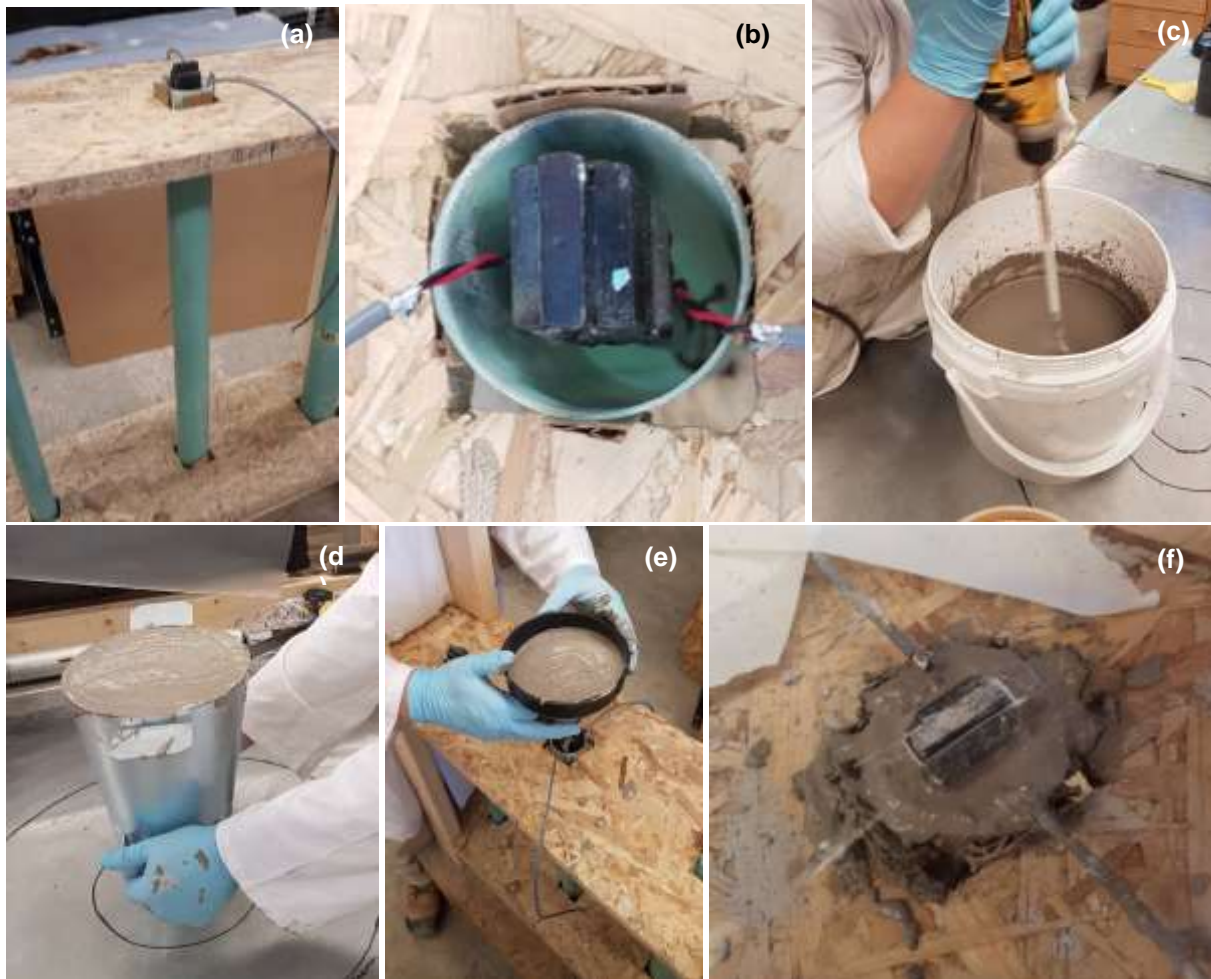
Specimen fabrication: (a) Steel core and FRP tubes are placed in casting stand; (b) tubes are shimmed to ensure steel is centered; (c) grout is mixed; (d) slump test is performed; (e) grout is funnelled into shells; and (f) top plastic cover is positioned to hold steel upright during curing
